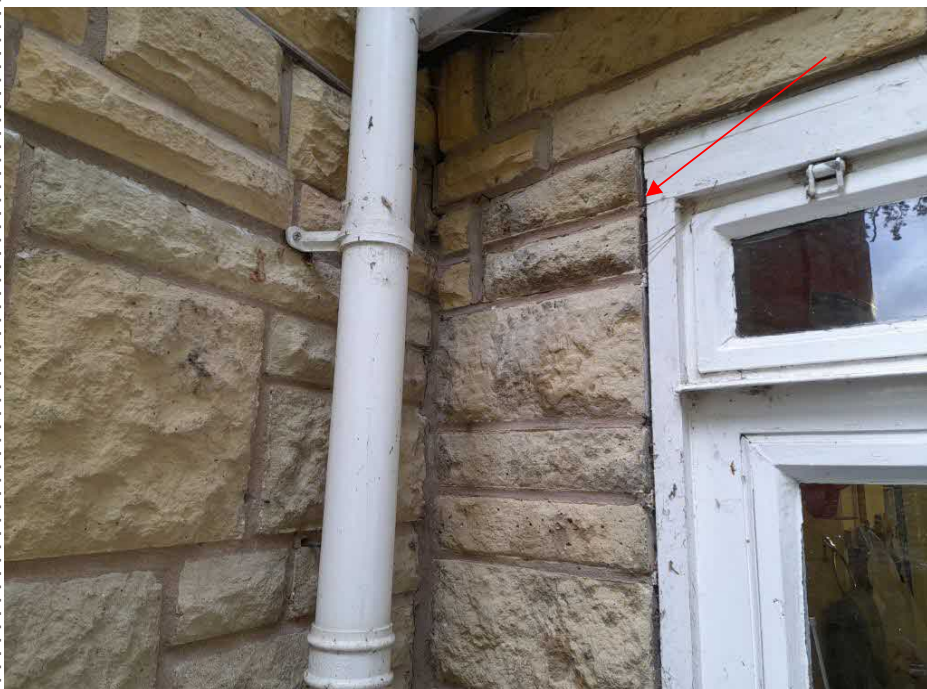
Vertical cracking to front elevation of single-storey addition.
